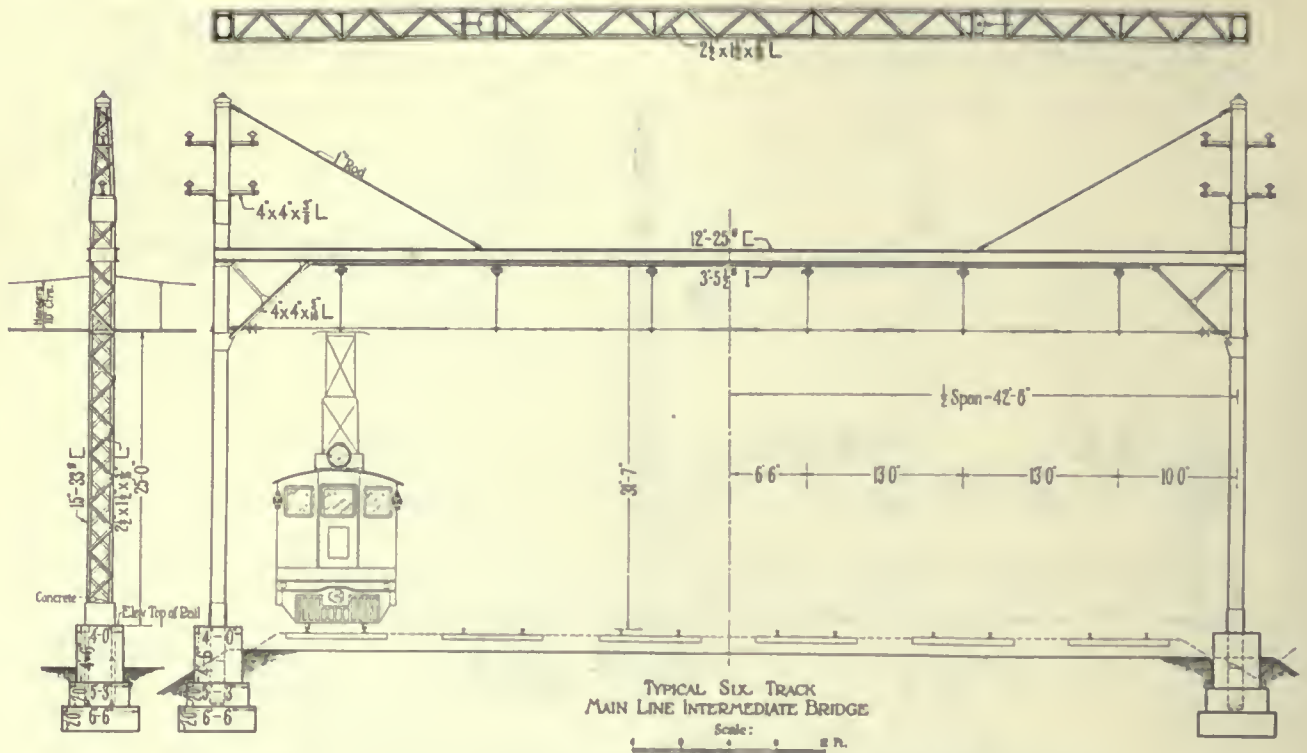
TYPICAL SIX TRACK STRUT BRIDGE WITH STRAIGHT POSTS
